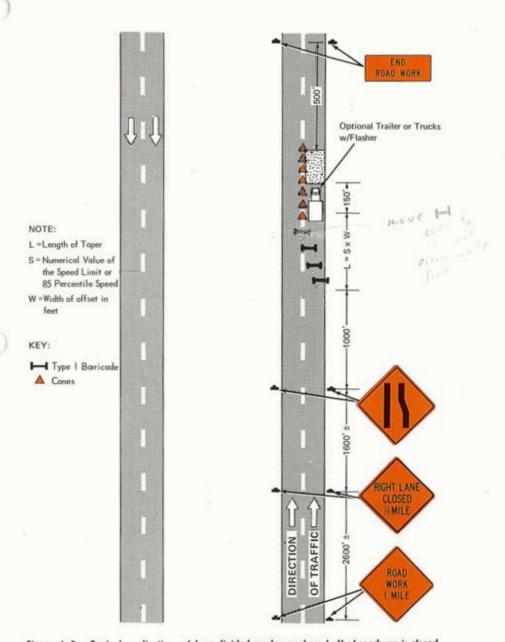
Typical application—4-lane divided roadway where half of roadway is closed.
